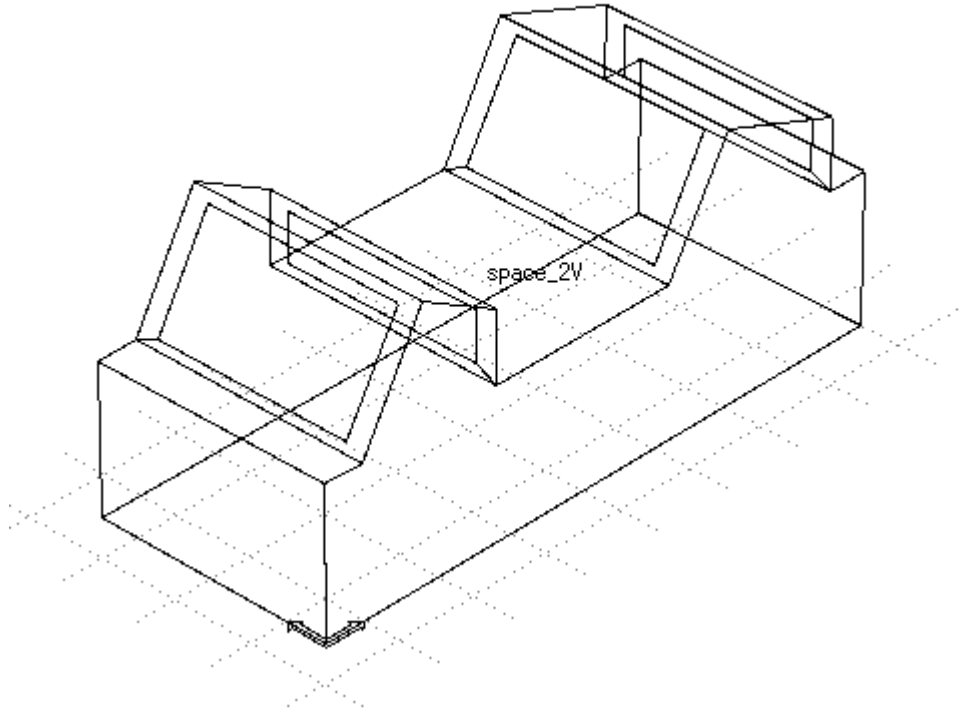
Monitor roof with two vertical windows facing East and West respectively
